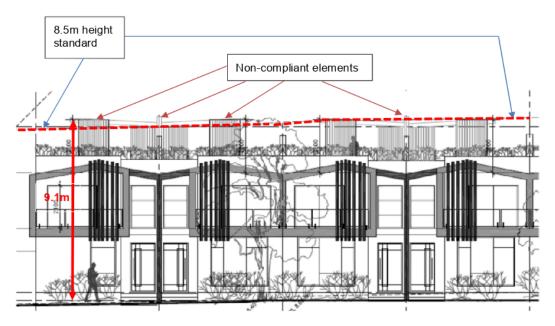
Extract south elevation (Dwellings 1-4) showing breaches to 8.5m height plane
